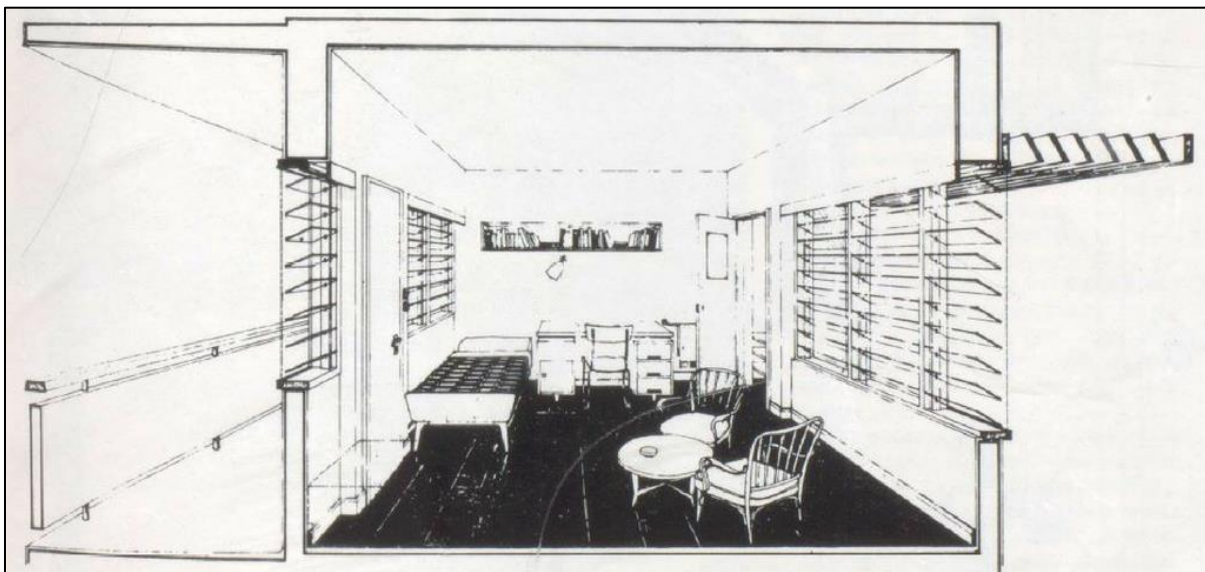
Section through a study bedroom of the new student residencies at the University of Ibadan, as designed by Design Group Architects – notice solid concrete walls, ceiling and floor slabs, glass louvred windows and sun breakers; source: Atkinson et al (1963, p.102).
